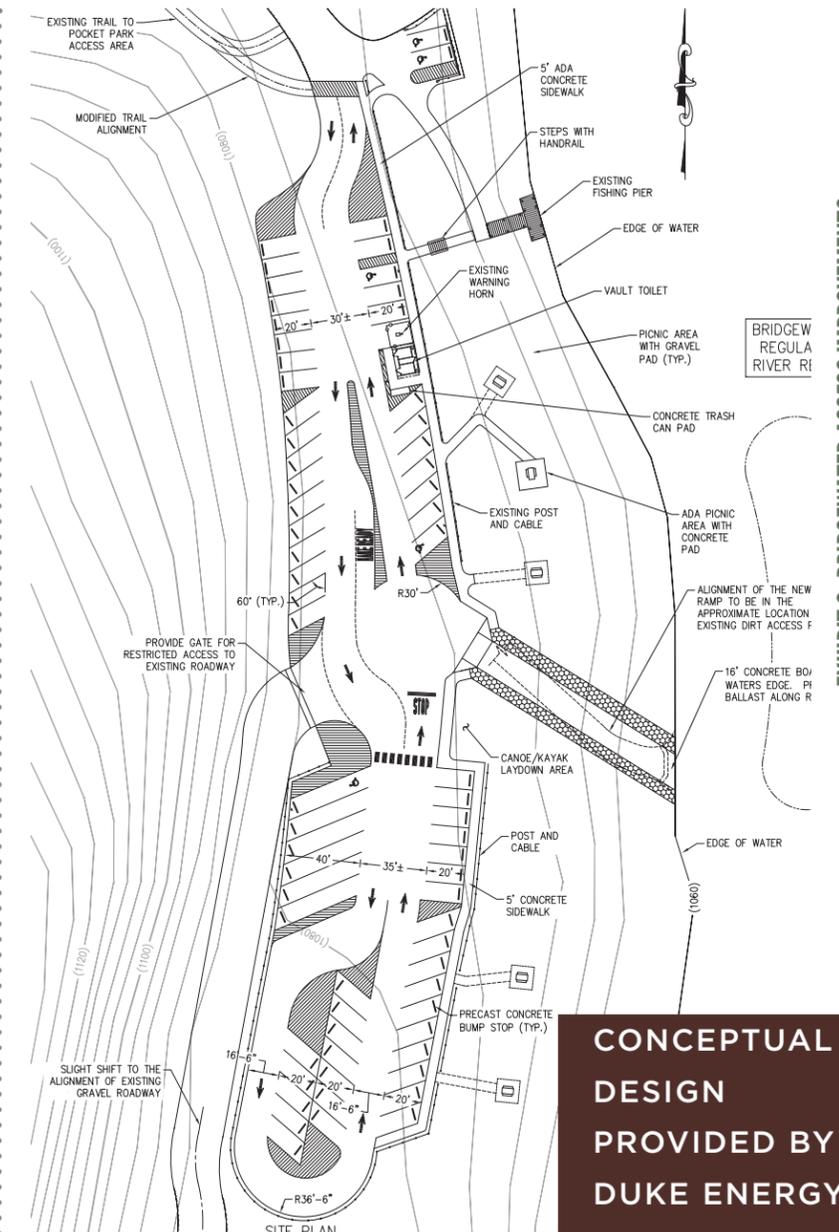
BRIDGEWATER ACCESS IMPROVEMENTS
